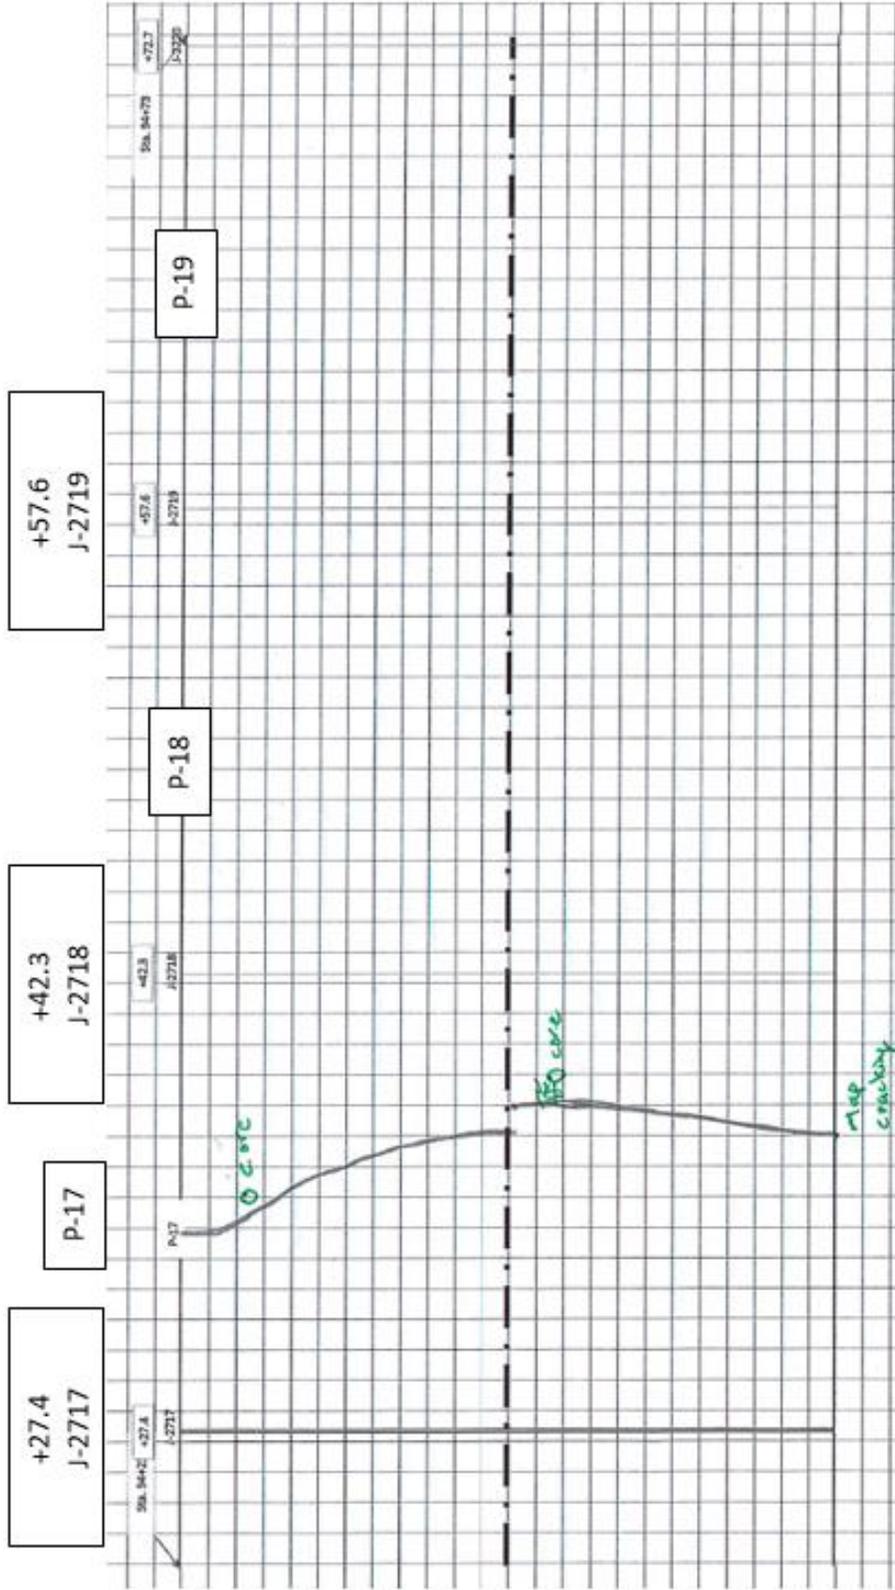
Schematic plan view of the cracking occurred on inside lane at cell 238
